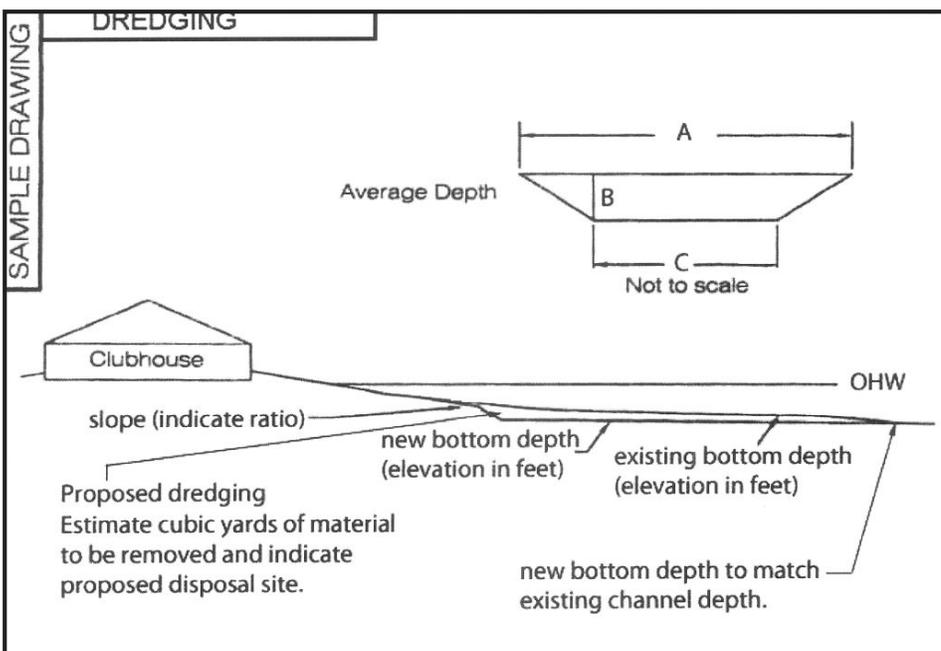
Sample dredging plan diagram. (Source: Ohio Dredging Fact Sheet, 2013)
